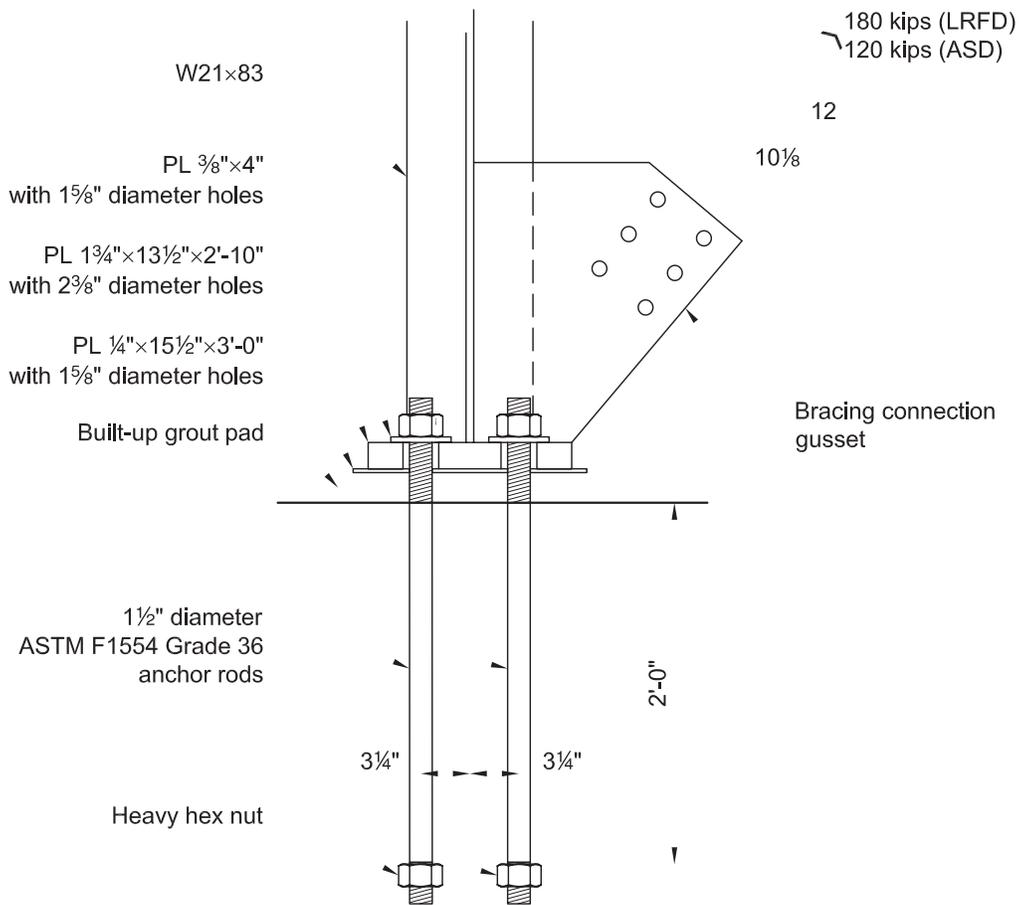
Base connection as detailed in Example 4.7-7.
